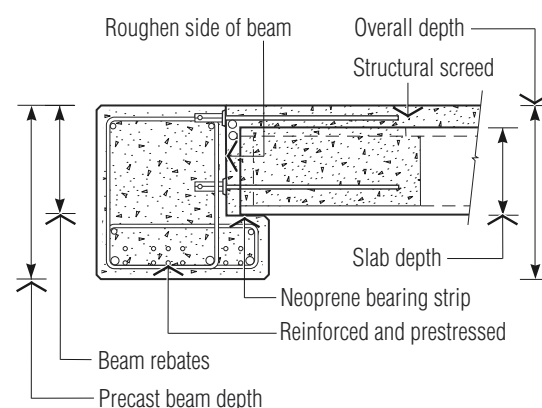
Concrete corbel or nib on a precast beam supporting a precast concrete floor
